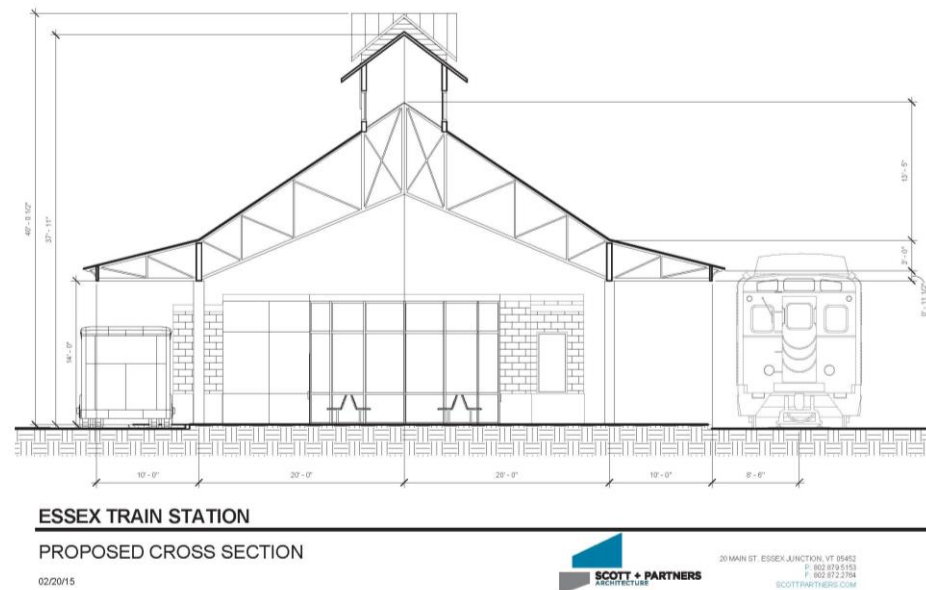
ALTERNATIVE 2 (FULL BUILD), PROPOSED CROSS-SECTION
